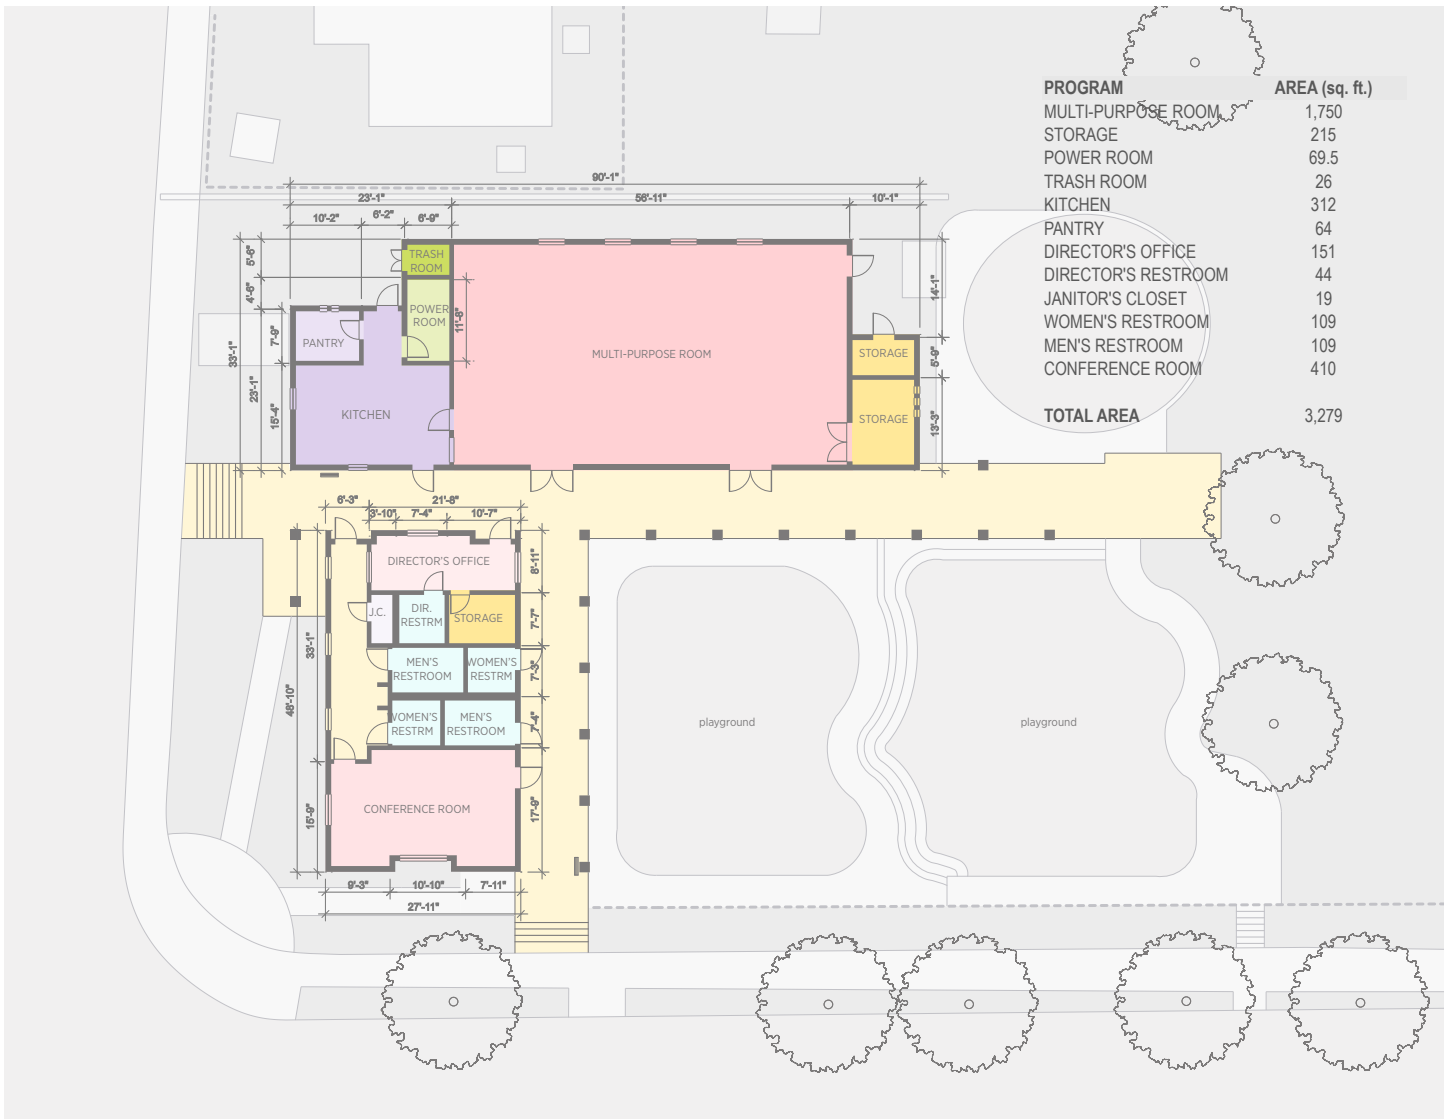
Floor plan of existing Silver Lake Recreation Center (above)
